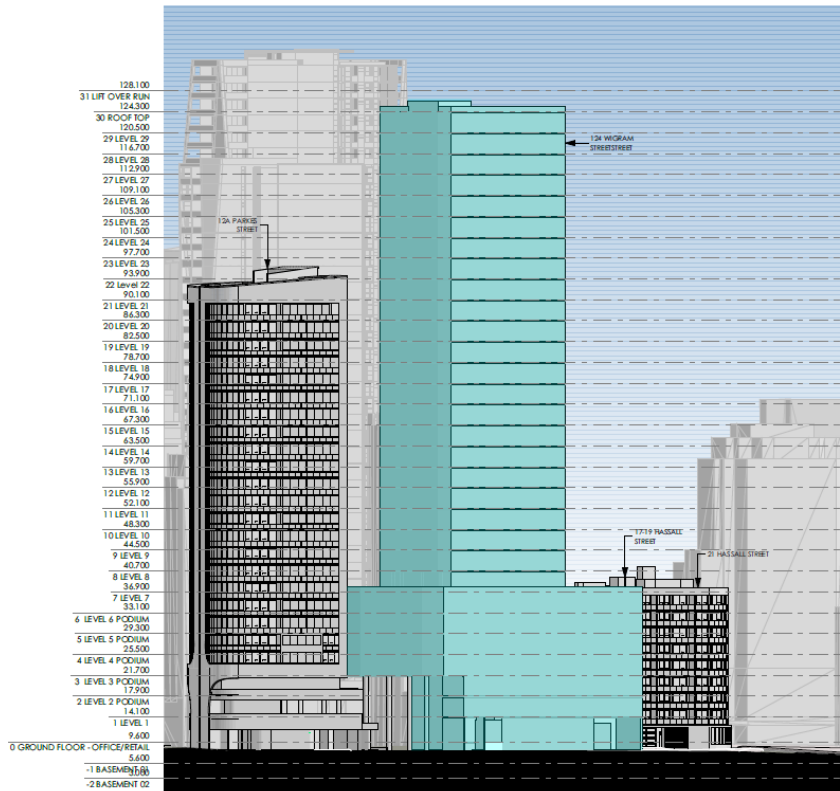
Proposed Mixed Use Building (Source: Applicant's Reference Design –Residential)
